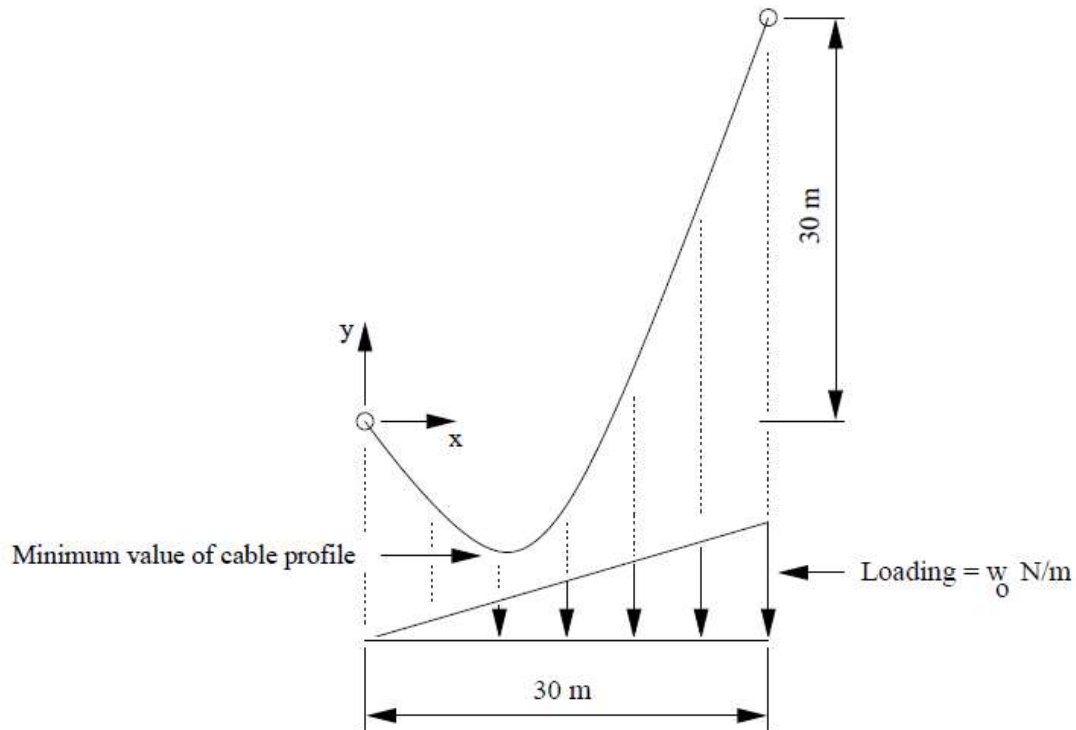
Elevation view of a swing bridge carrying a triangular loading.
